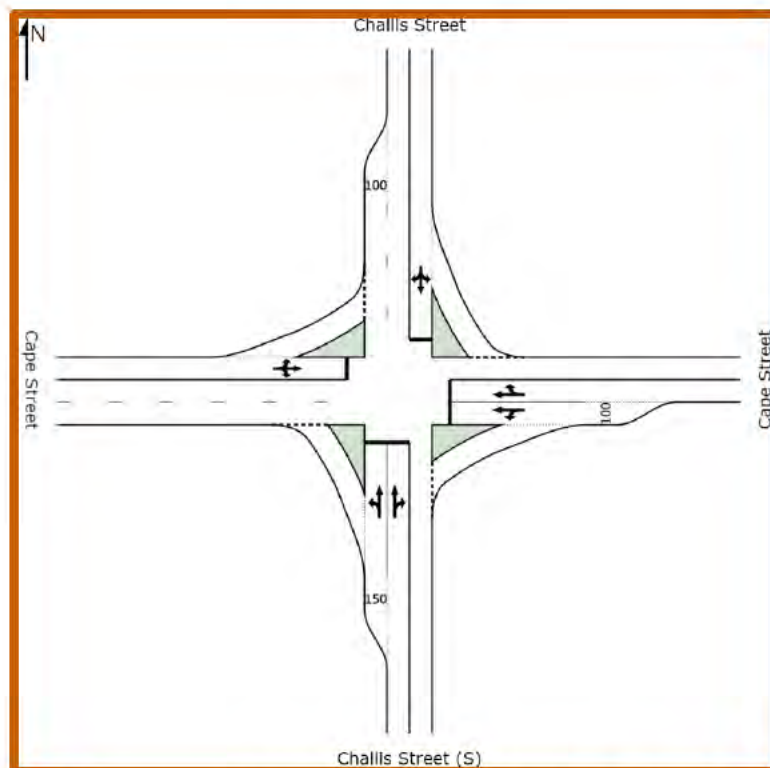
Recommended Layout for the Intersection of Challis Street and Cape Street
